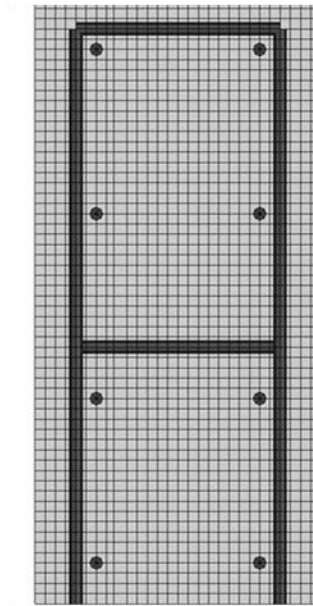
Cross-sectional view of the concrete parapet with horizontal and vertical steel reinforcement.
